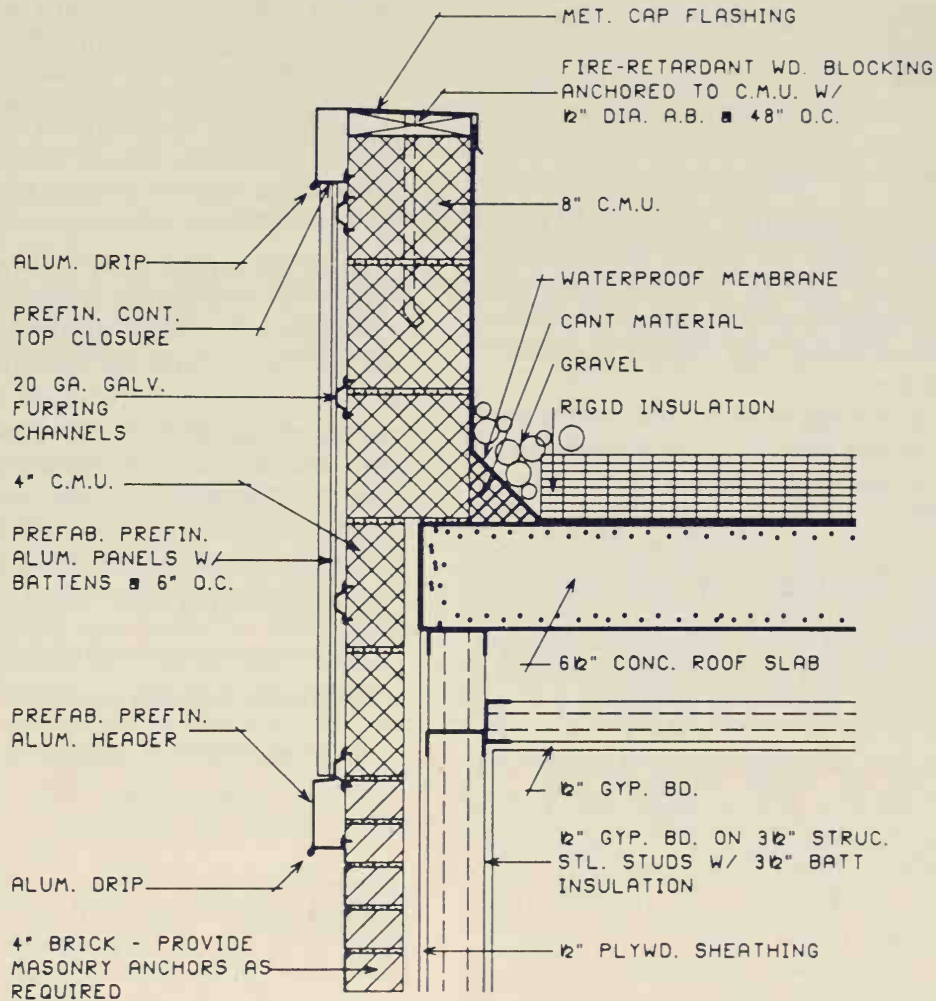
Drawing produced on a CAD system (Courtesy Tektronix, Inc.)
